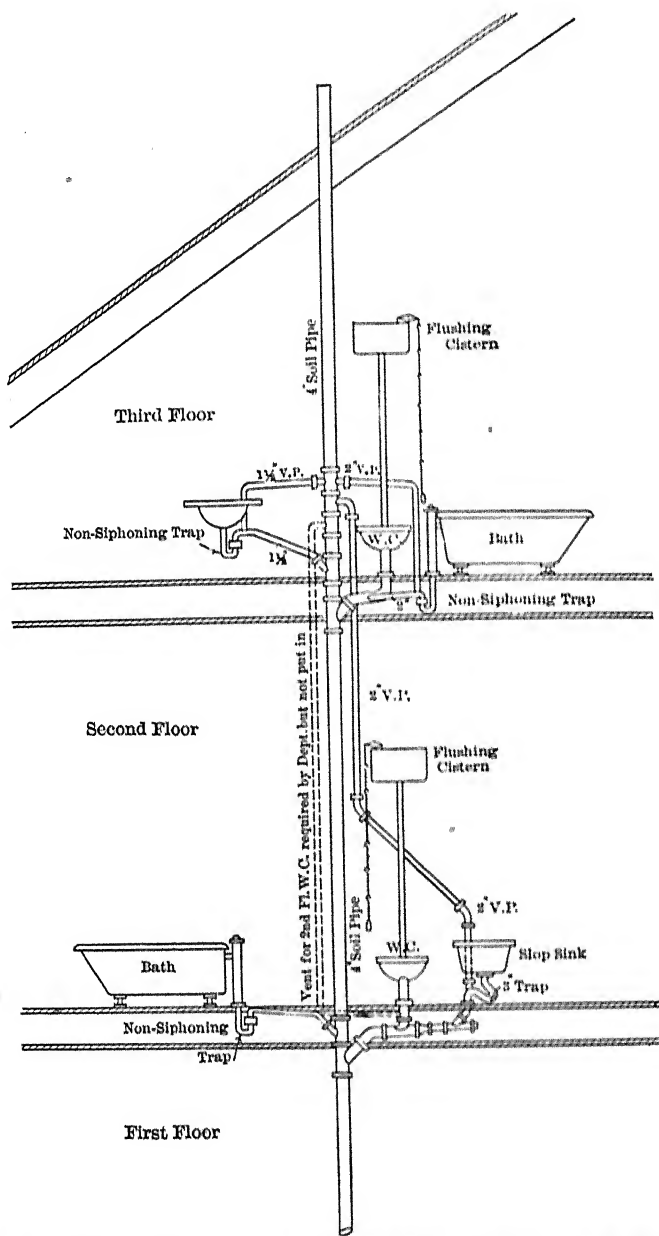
Section of House Showing Arrangement of Plumbing as Carried Out.
